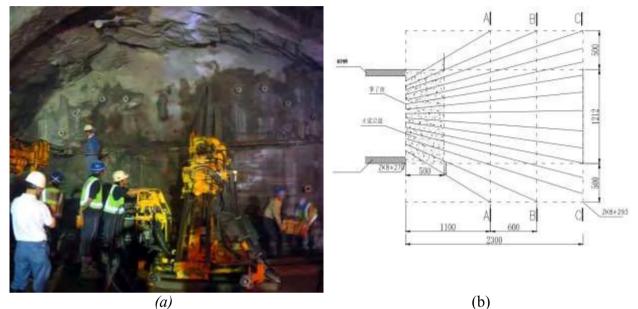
(a) The drilling of pre-grouting holes at A2 tunnel. (b) The pattern grout holes profile in group A, B and C, the first round in A1 tunnel.
